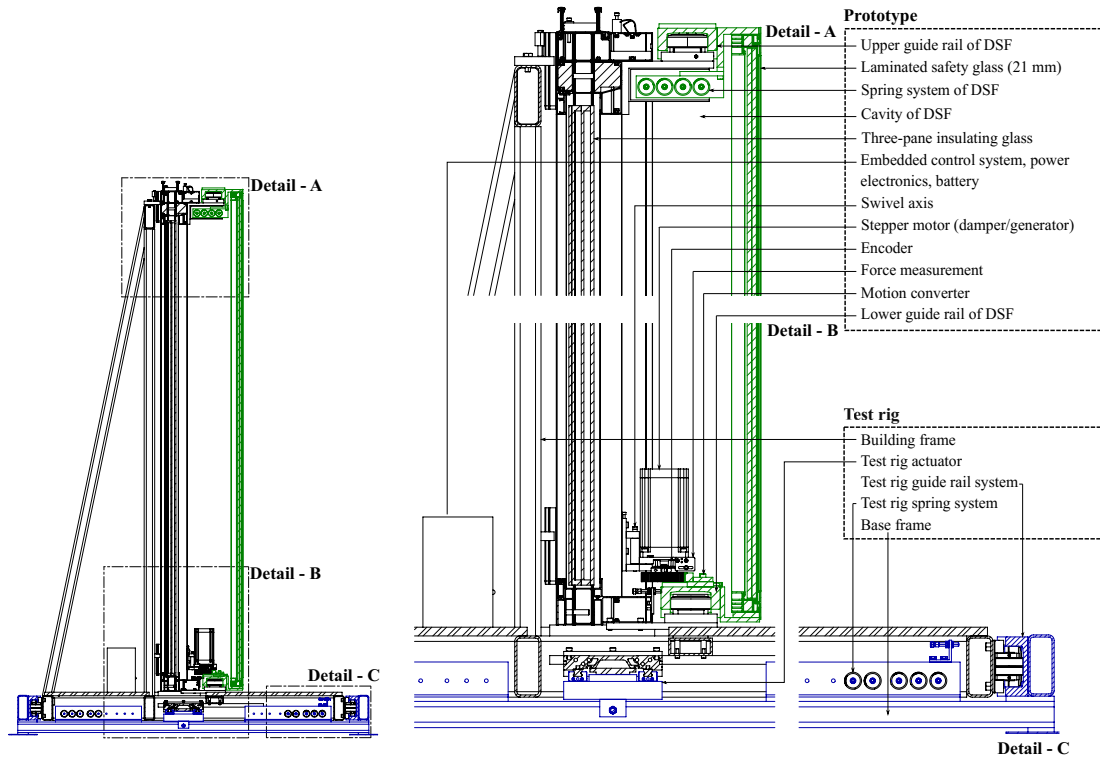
Side view of the prototype on the test rig with details (the moveable part of the prototype is marked in green).
